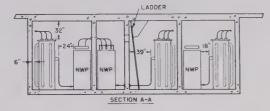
Typical layout of subsidewalk vaults at building time; three 1,000-kva banks
